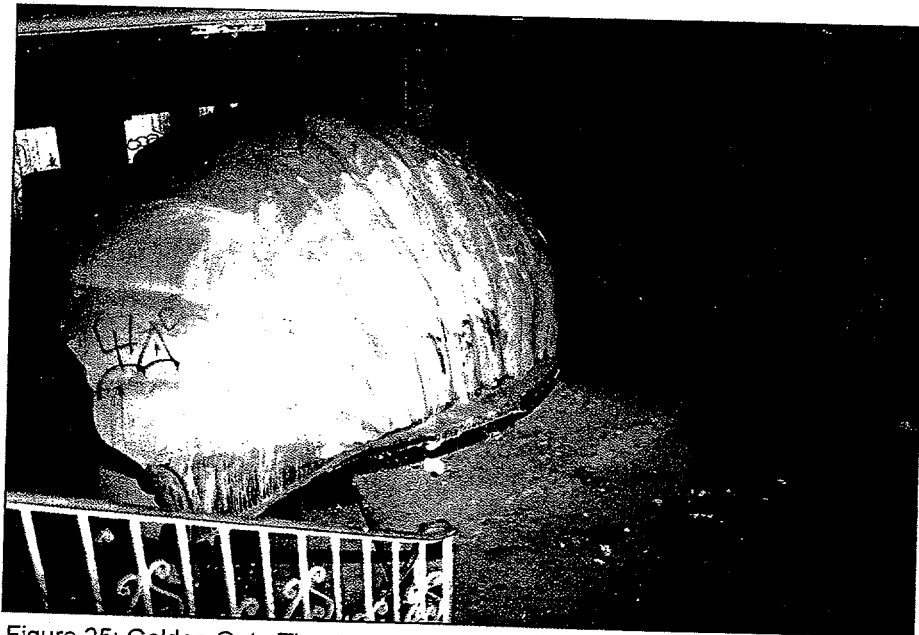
Golden Gate Theater, interior, view northeast of lobby concession shell showing attachment to stair to balcony (Chattel Architecture 2009)
